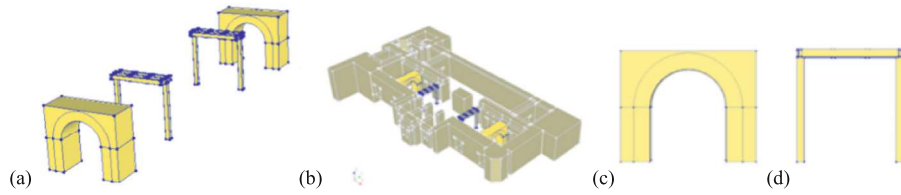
(a) building the sub-structures considered in the intervention; (b) placing the sub-structures into the base model; (c) front view of the stone arch geometry; (d) front view of the steel frame geometry.
